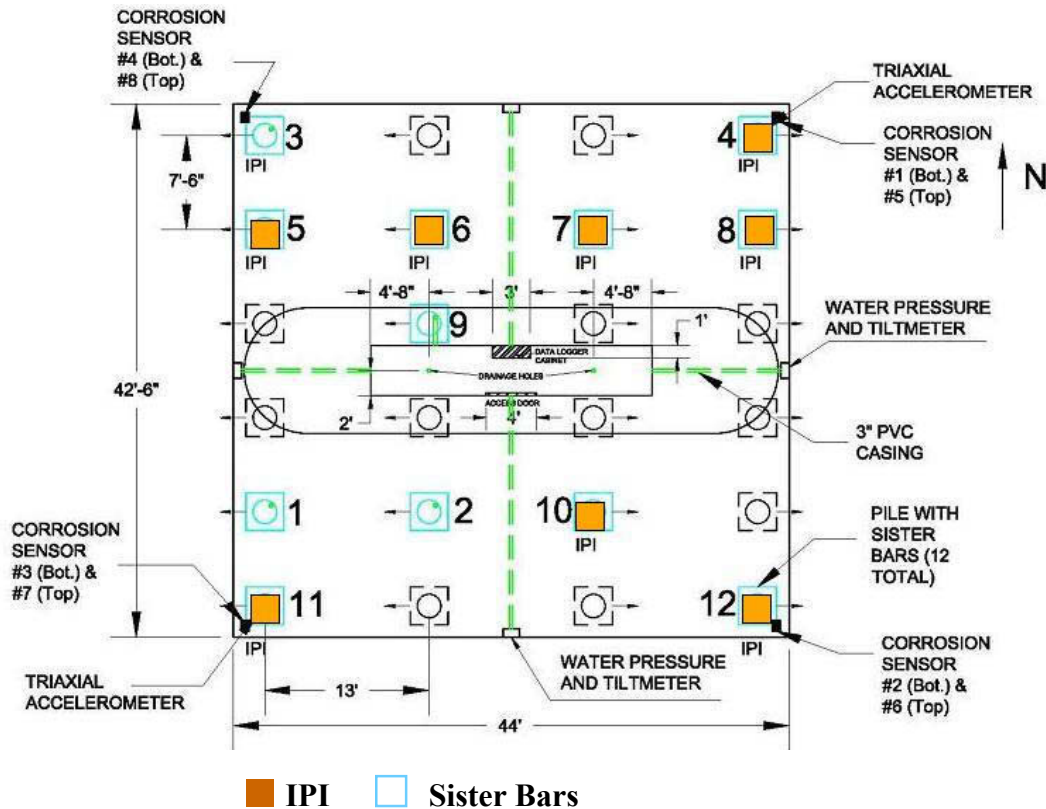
Plan View of M19 Pier Footing with Layout of Substructure Instrumentation
